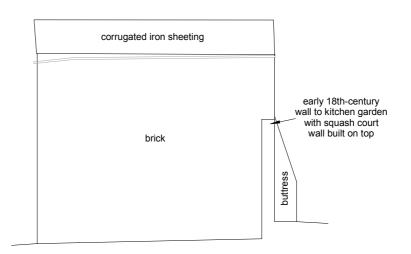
Structure 14, 1886-98 squash court north-east elevation.
